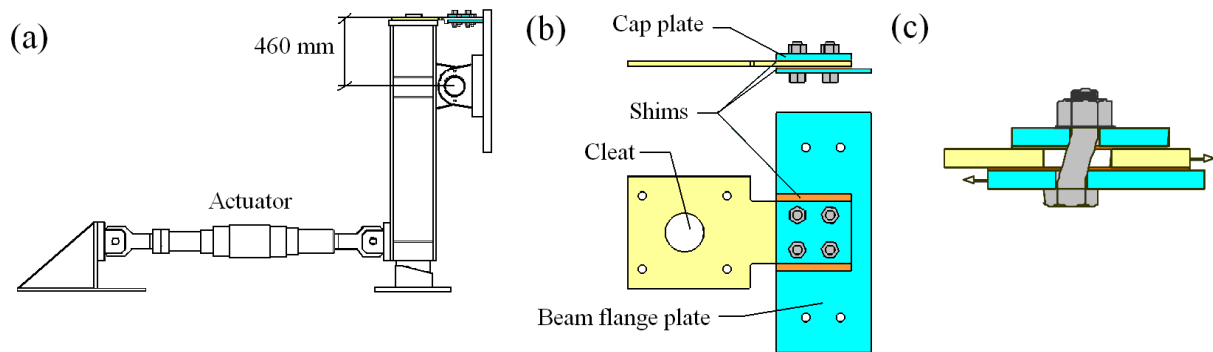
Bolt component test setup (a) layout and (b) side view and plan of specimens, and (c) sliding bolt conditions
